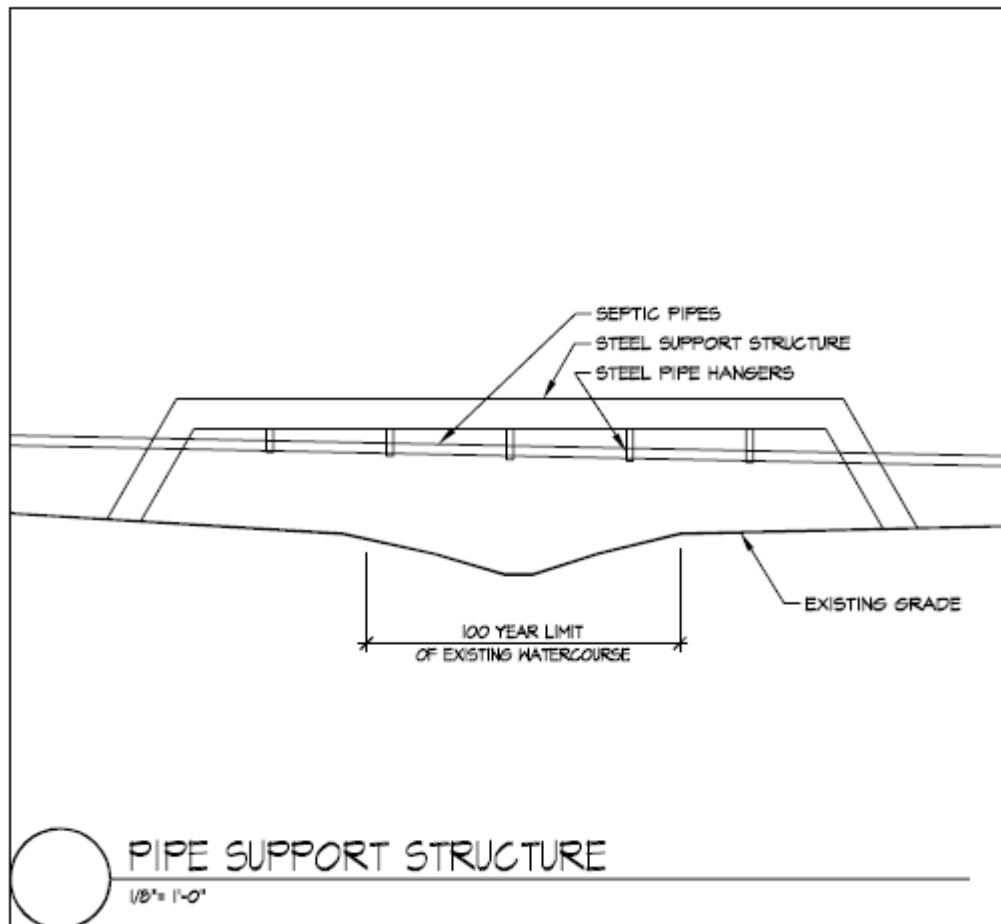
Proposed pipe support structure crossing drainage on the project site.
